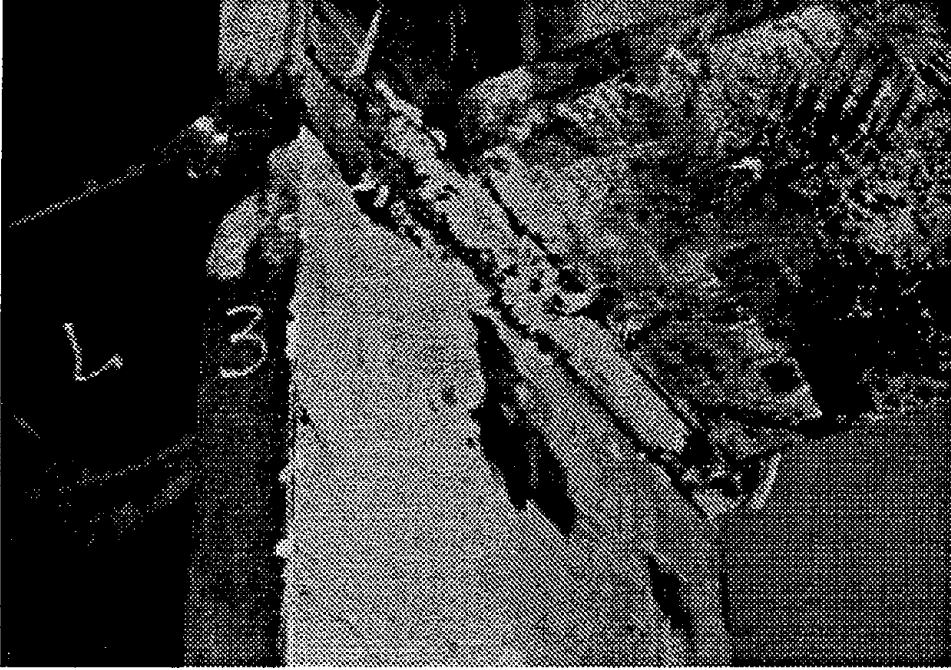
Photograph showing the fractured bottom beam flange of SAC PN3 specimen after test.
